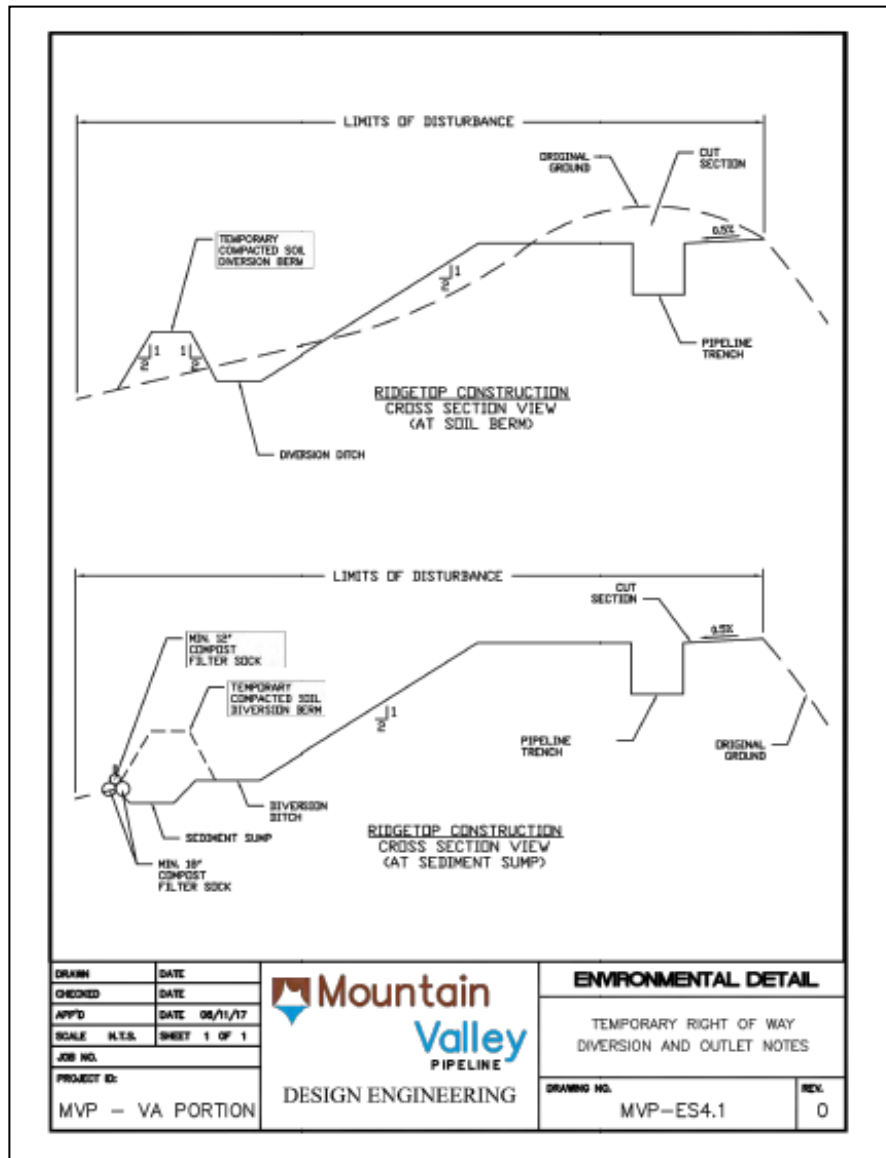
Excerpt from MVP POD Appendix C-3 E&S Plan Sheets of Environmental Detail MVP-ES4.1, illustrating ridge leveling for construction in the MVP ROW.
